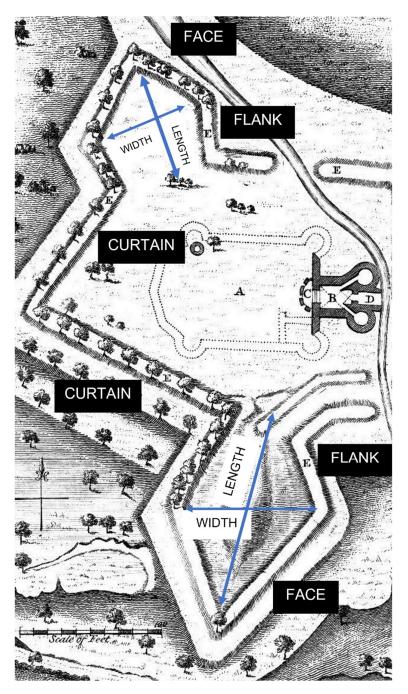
Bastion components (based on a plan of Donnington Castle)
